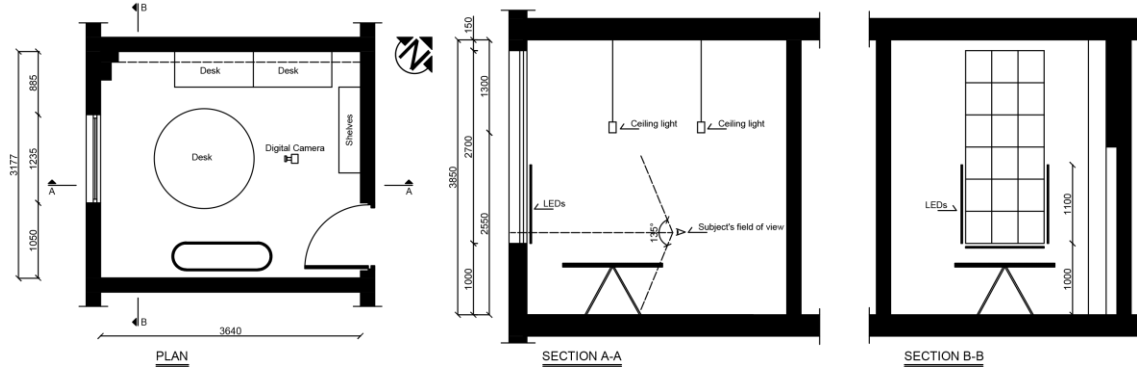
Plan and sections of the test office room in Brisbane, Australia
